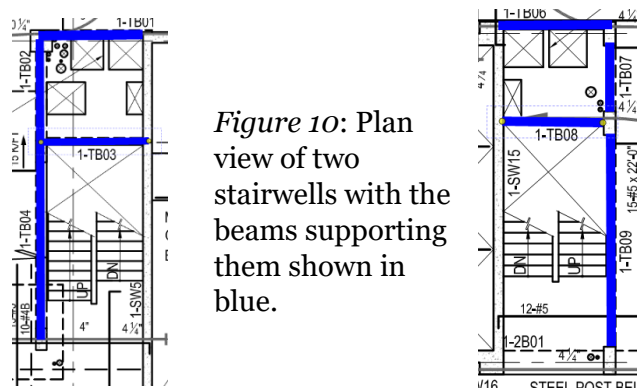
Plan view of two stairwells with the beams supporting them shown in blue.
